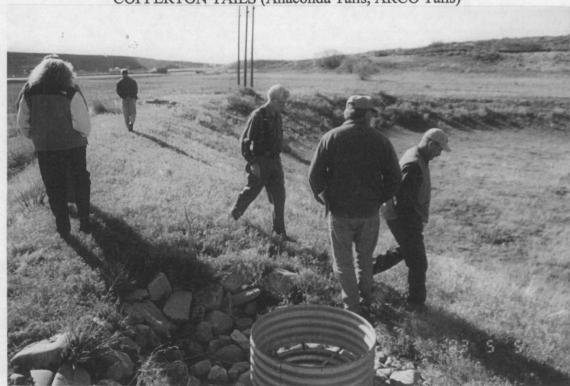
COPPERTON TAILS (Anaconda Tails, ARCO Tails)
